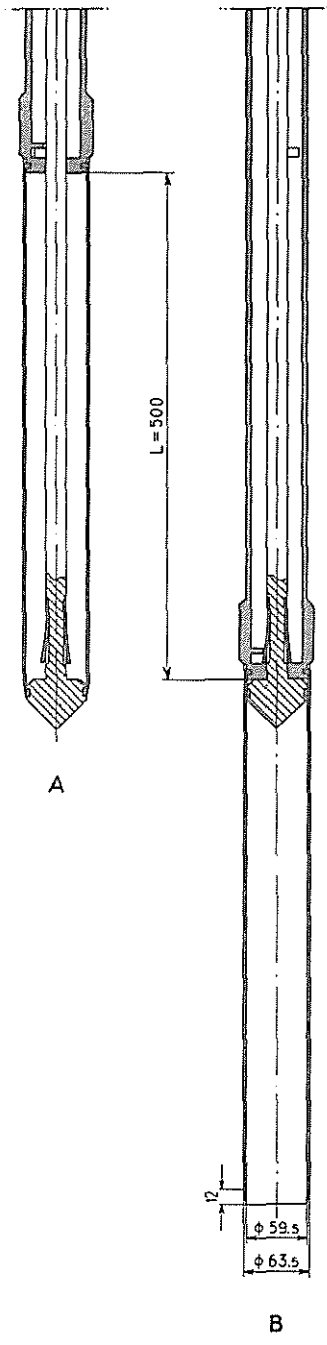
Schematic drawing of Shelby tube piston sampler.
